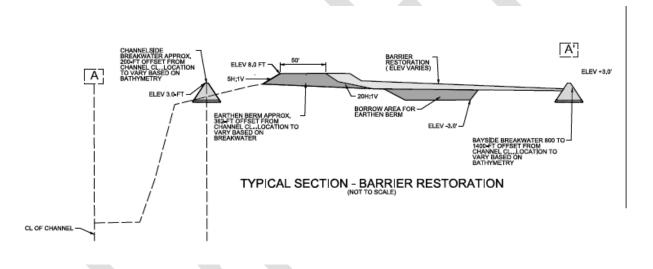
Typical Section for Beneficial Use Placement Area (New Barrier)
